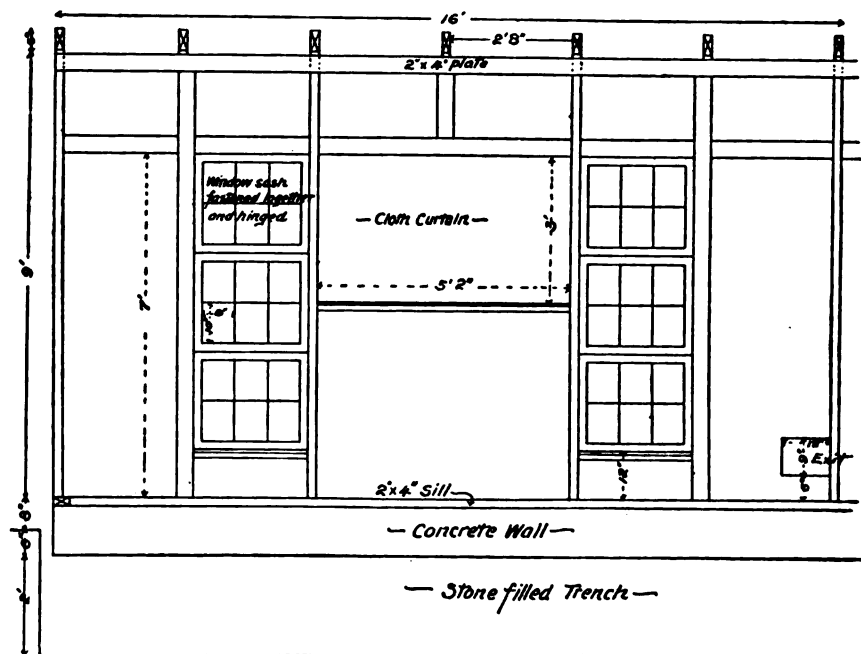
Front elevation of the Cornell poultry house with pens 16 feet square. The window sashes are fastened together and hinged on the side so as to open like a door. Windows not to be used as doors are covered with poultry-wire netting.
